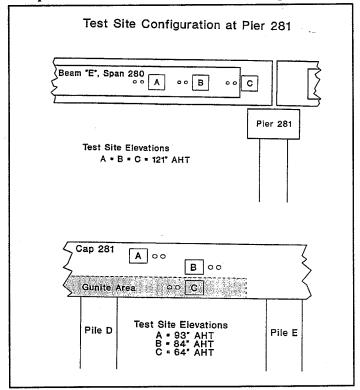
Test site configurations, Pier 281. The squares denote anode test windows; small circles denote location of rebar test probes. Elevations indicated are above high tide (AHT) level.
